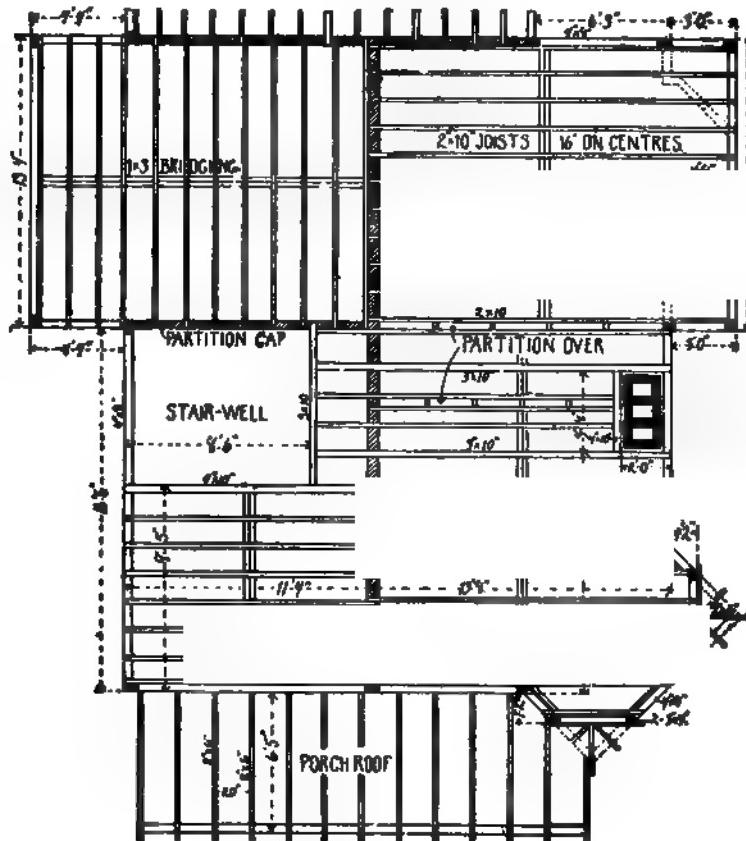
Second-Floor Framing-Plan for a Dwelling.
